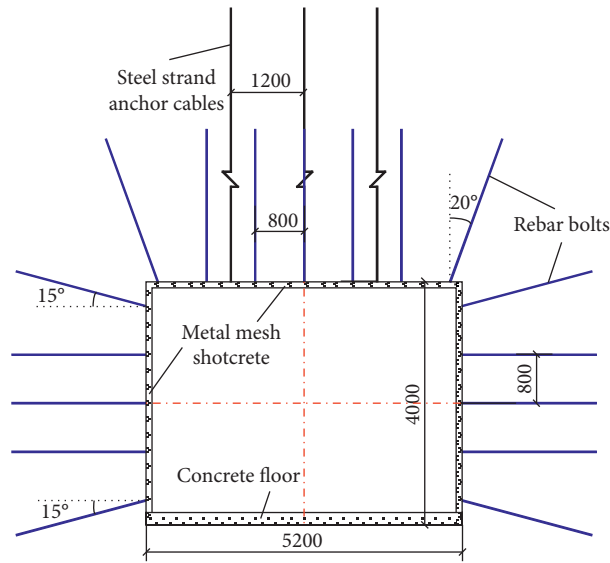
The support of anchor-net-cable-spraying for the south wing general return air tunnel.
